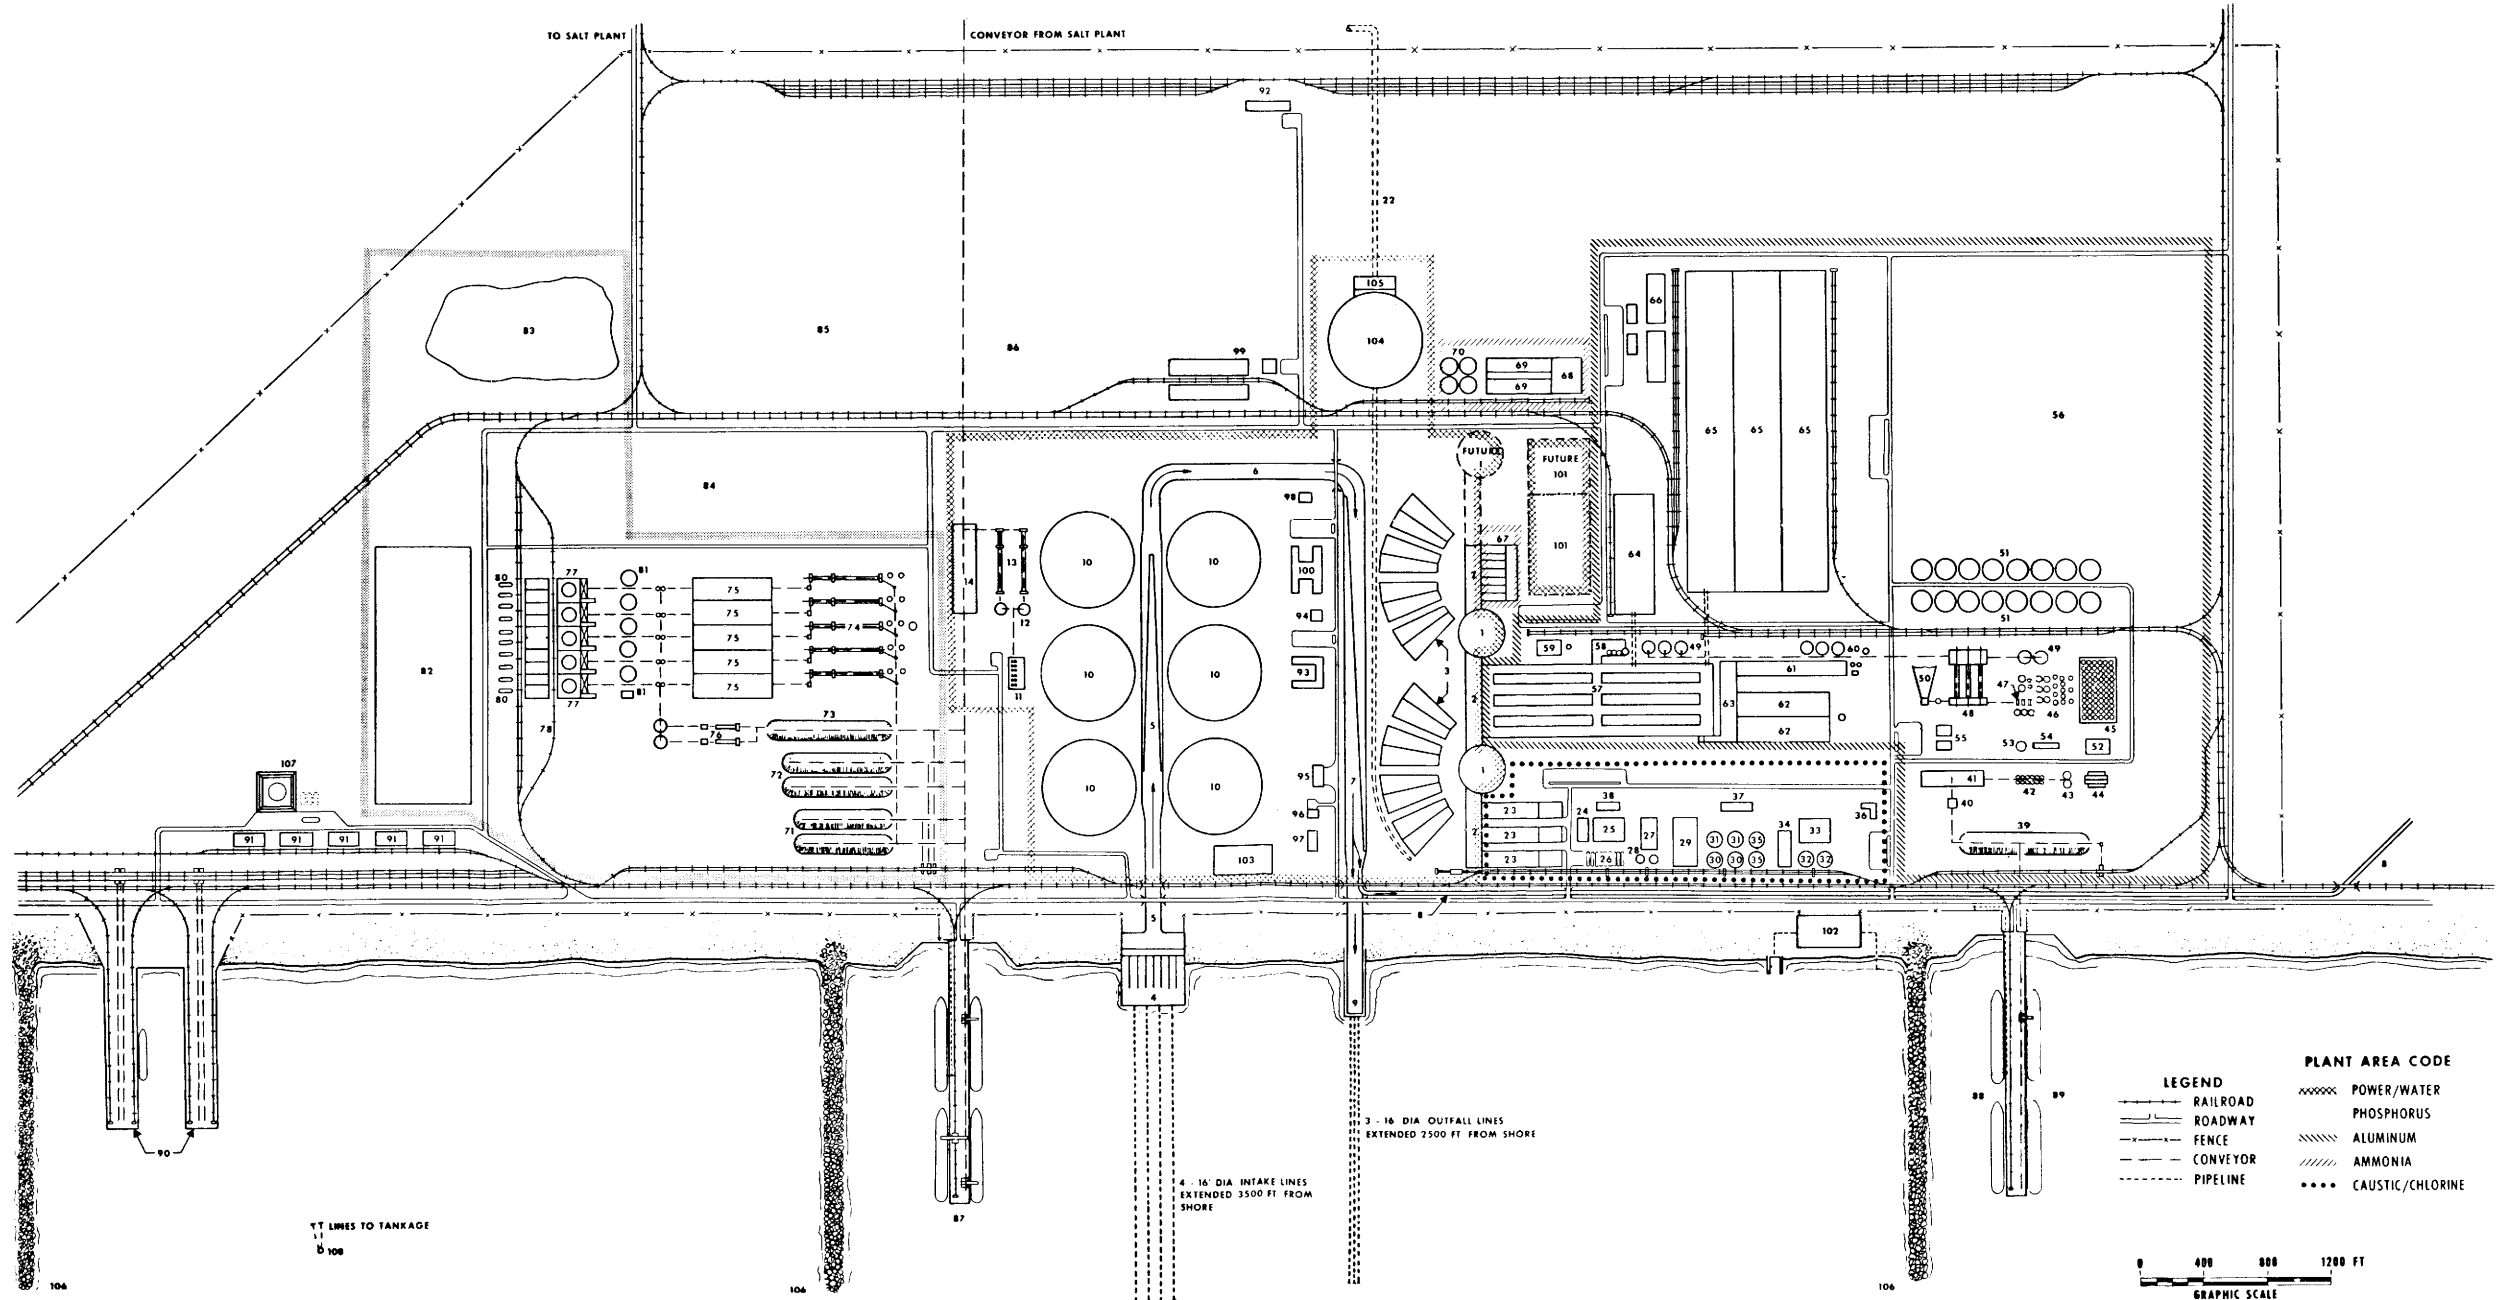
Typical Layout of Agro-Industrial Complex.
